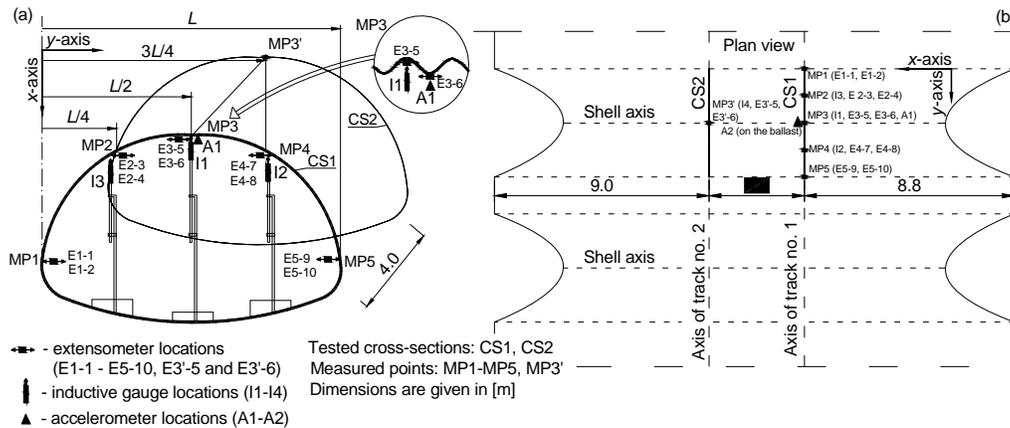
Arrangement of sensors on the shell bridge: (a) cross section, (b) plan view.
